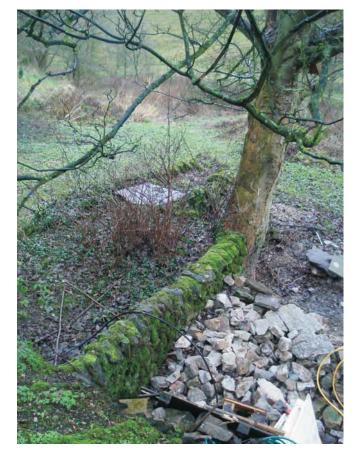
Section of the raised bank and retaining wall of the former mill pond
